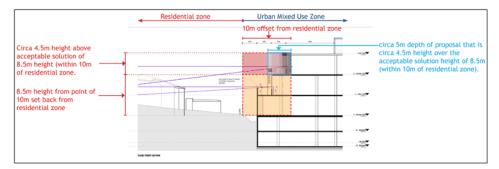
Extent of the building outside 8.5m within 10m of the boundary to Clare Street properties (source: SPA adapted by Ireneinc)
